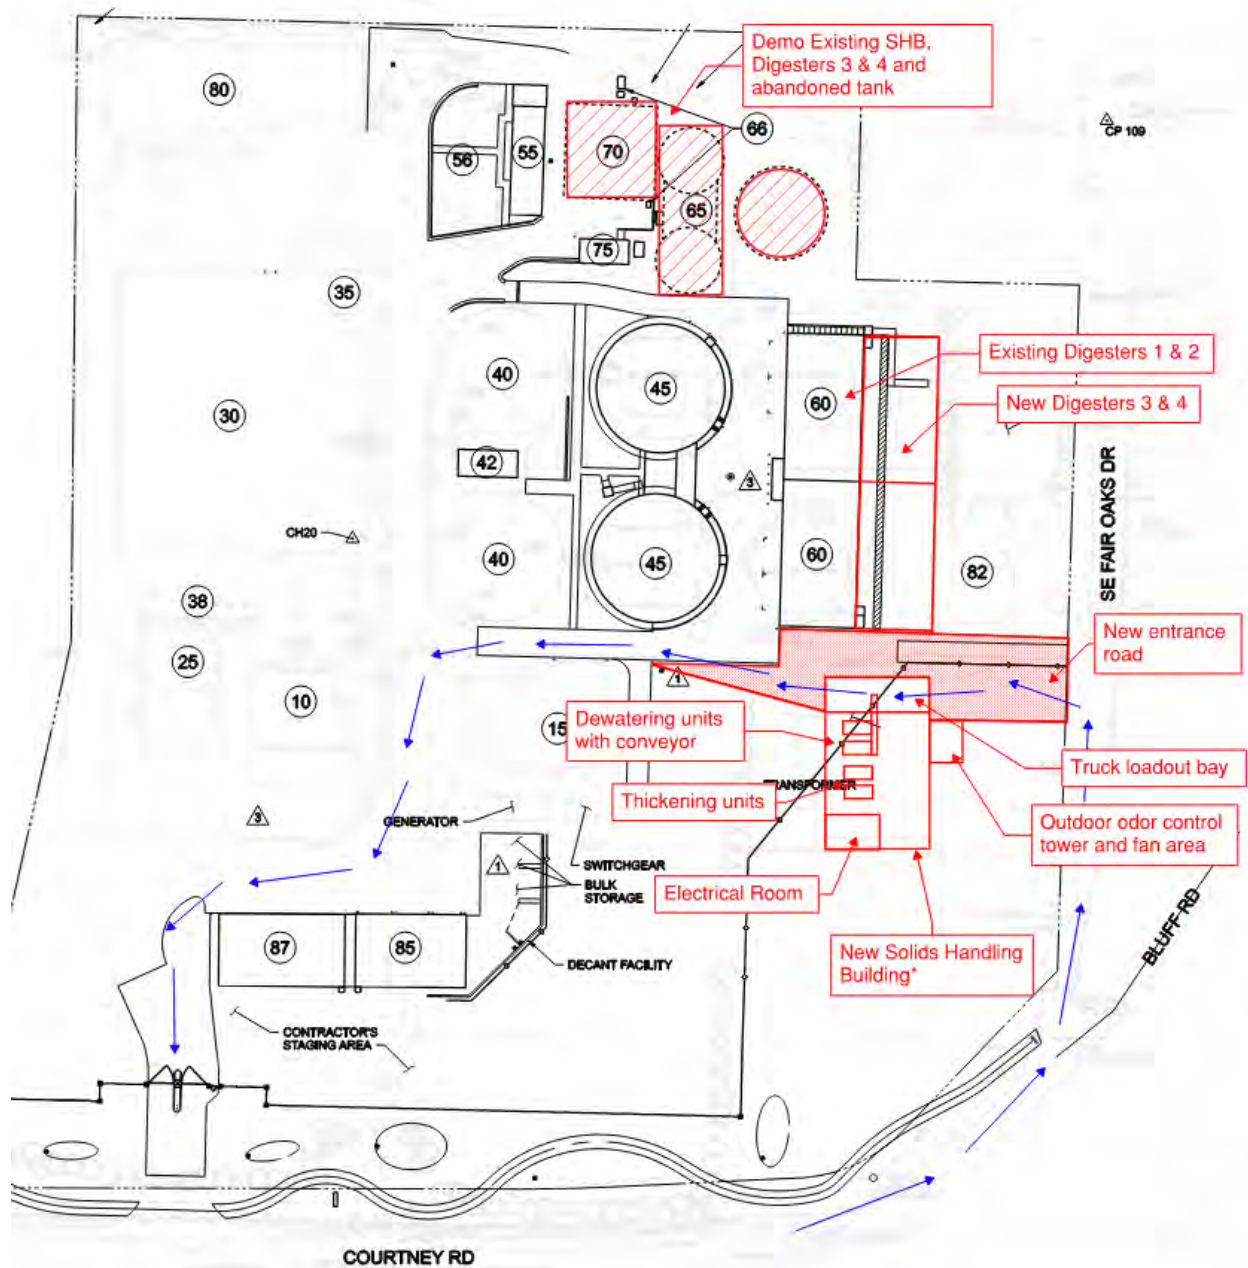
Alternative 2 - South Solids Handling Facility and Expansion of Rectangular Digesters
